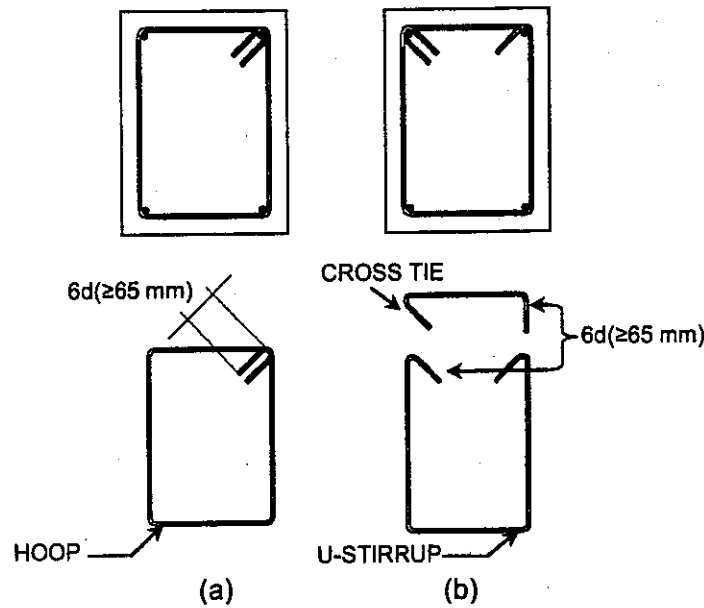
DETAILS OF TRANSVERSE REINFORCEMENT IN BEAMS
